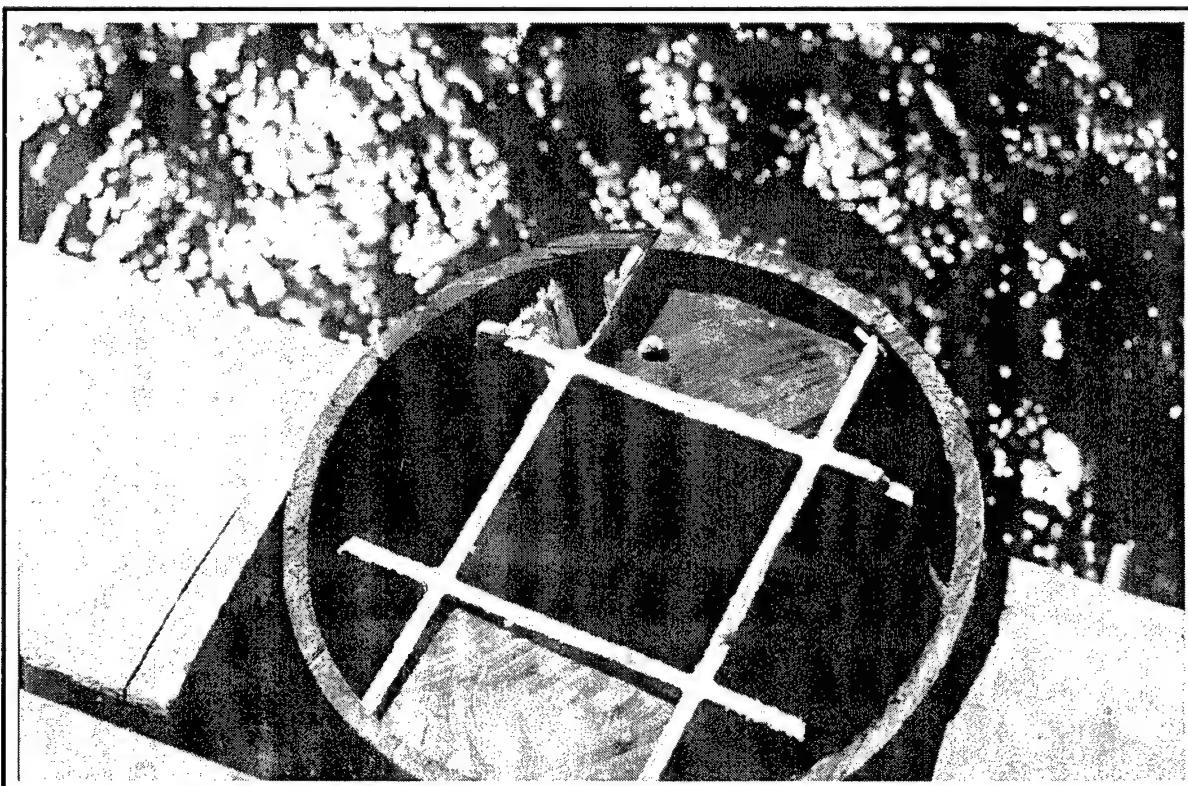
Creative Pultrusions' fender piling system installed at Tiffany Street Pier, New York City, NY.
